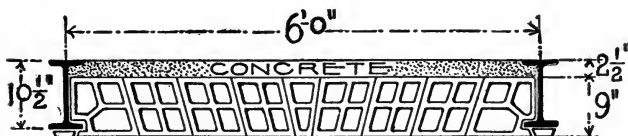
Terra-cotta Arch used in Home Insurance Building, Chicago (1884).
